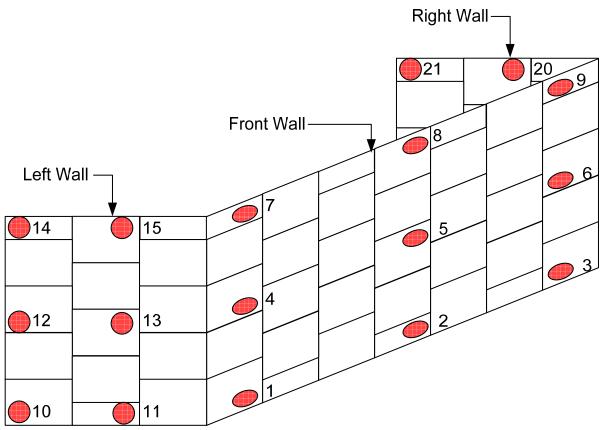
Strip tensile force and MSE wall earth pressure monitoring positions.
